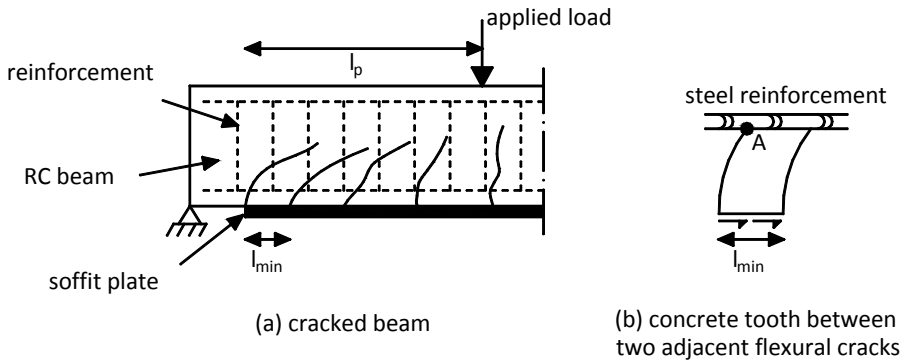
Concrete tooth model (Zhang, Raof, and Wood 1995)
